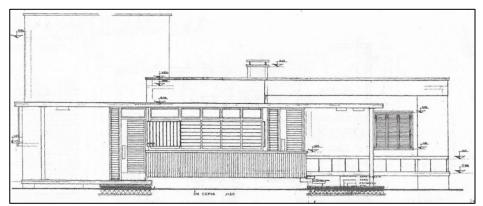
Tangül Family Residence Project Elevation Drawing (Feridun & Feridun, 2013)
